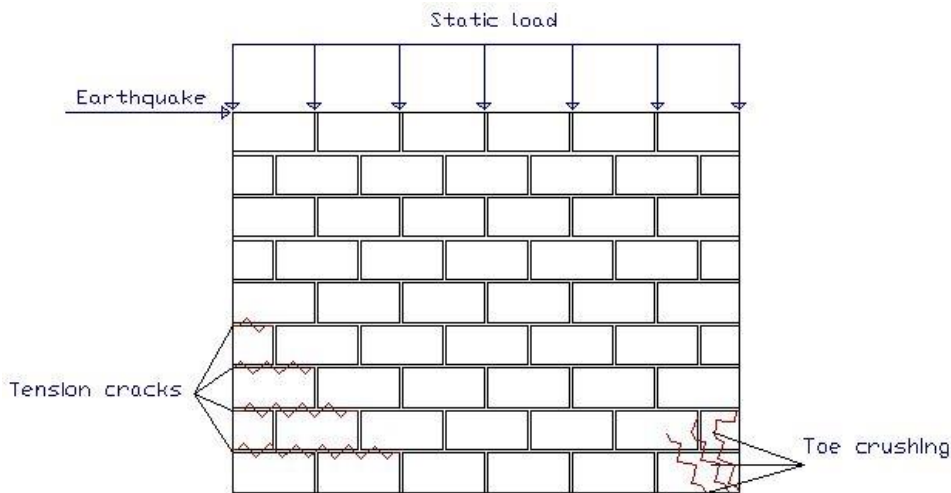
Flexural bending failure of masonry with (or without) toe crushing
